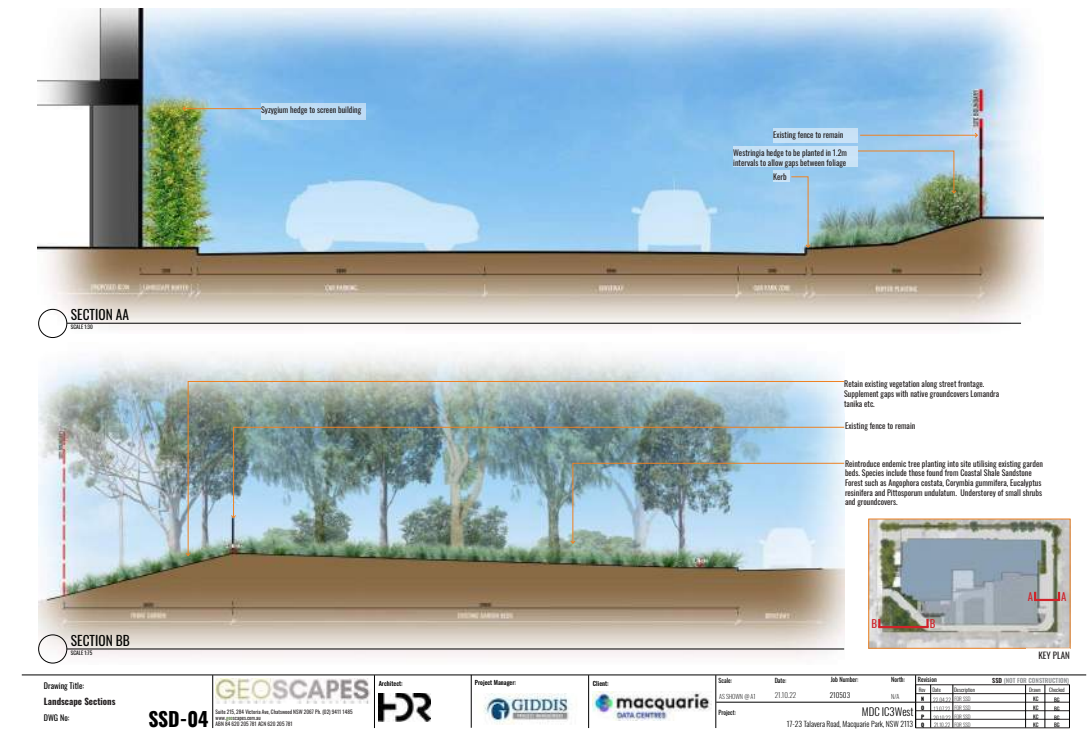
Landscape Sections Sheet 1 - (Source: Geoscapes)
